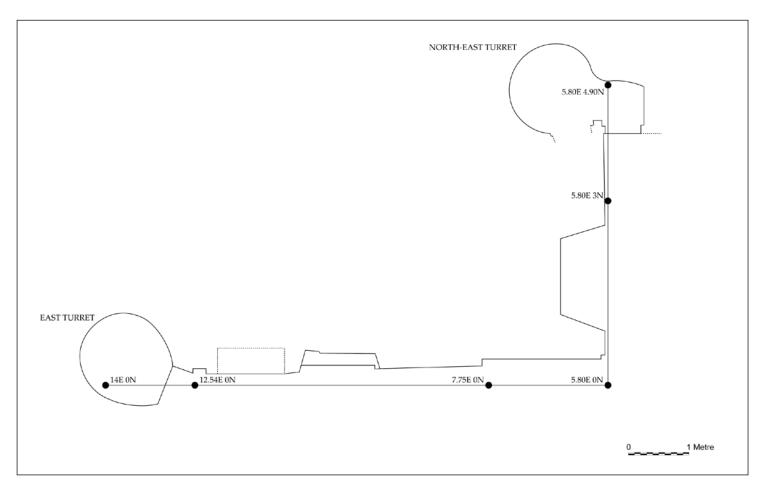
Plan Showing NE & E Turrets and grid points (drawn to fix the survey)
